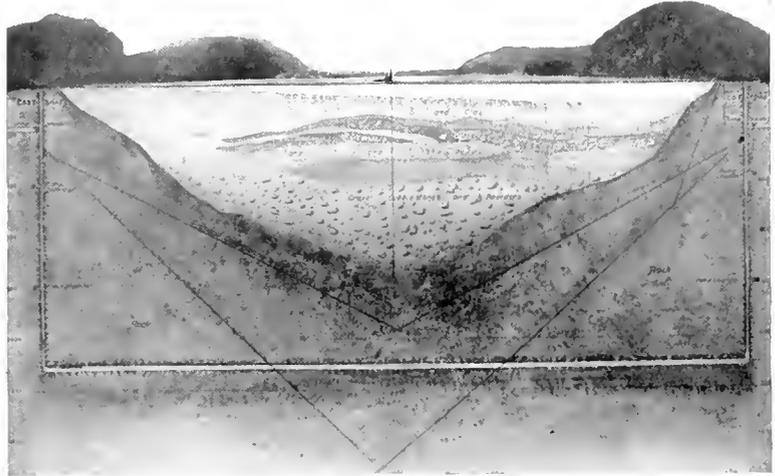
Section of Hudson River at Storm King, showing Pressure Tunnel and Borings
